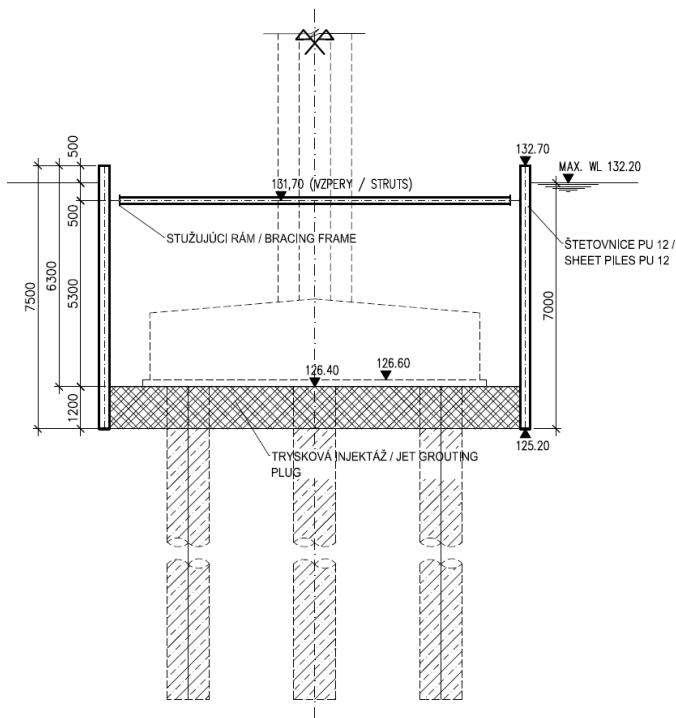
Cross section of the construction pit including the deep foundation on C4 pier of an approach bridge
